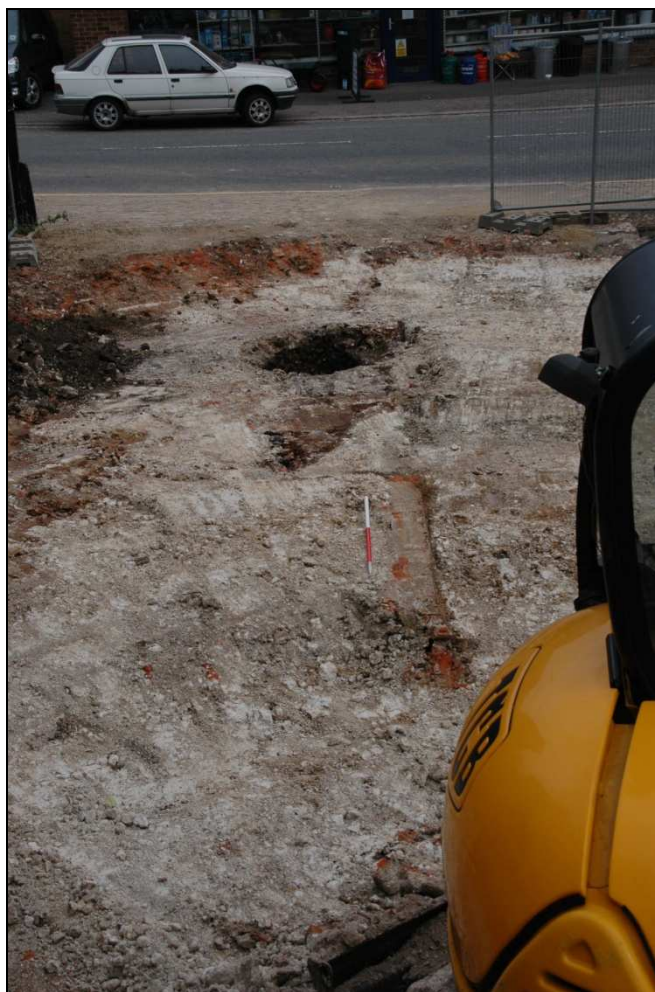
Alignment of Wall [003] relative to Well [004] (looking east)
